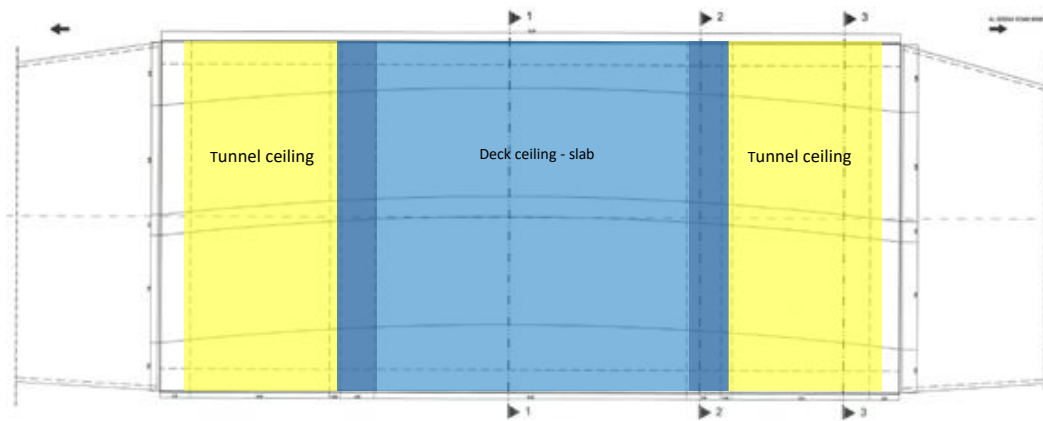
The position of characteristic transversal cross sections of the bridge
